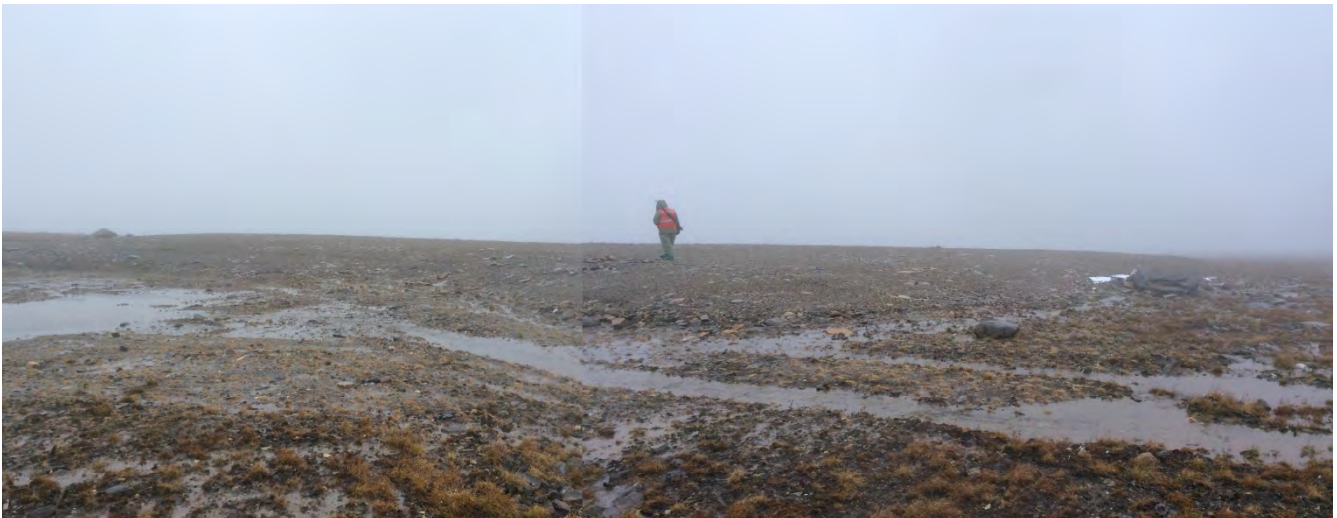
Station West Landfill, Lobe E2 – North slope and toe, facing south (ATT196\_Photo1.jpg)
